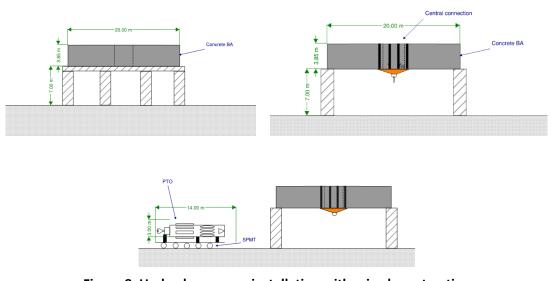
Underslung pump installation with raised construction at dry dock or quayside for CETO 6 WEC device.
